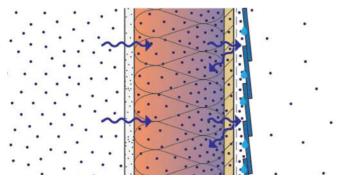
Vertical Section through Insulated 2x6 Wall with Vapour Impermeable Cladding
